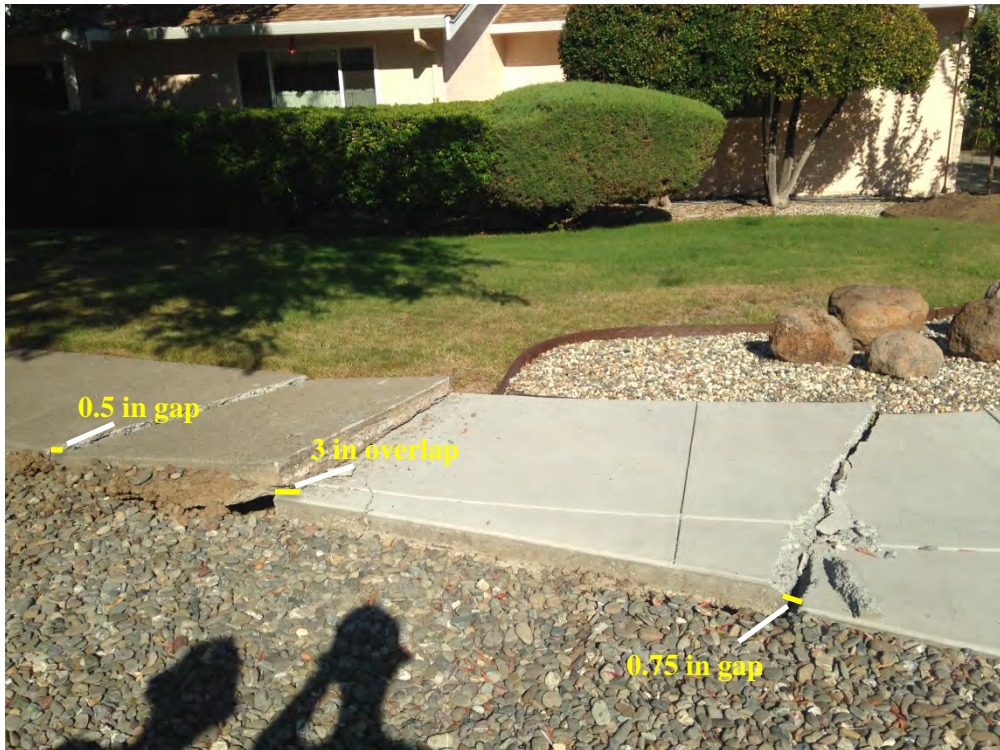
Measuring an overlapped compression zone with a gap in sidewalk pavement [NSF-GEER; N 38.3047 W 122.3459; 8/26/2014 16:52]
